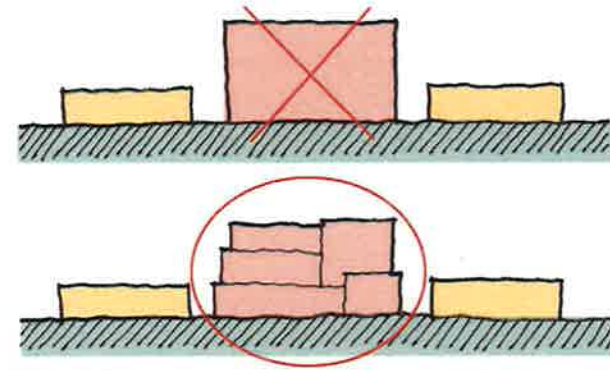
The mass of the larger building steps down near smaller buildings and the varied roof forms reduce apparent size.
